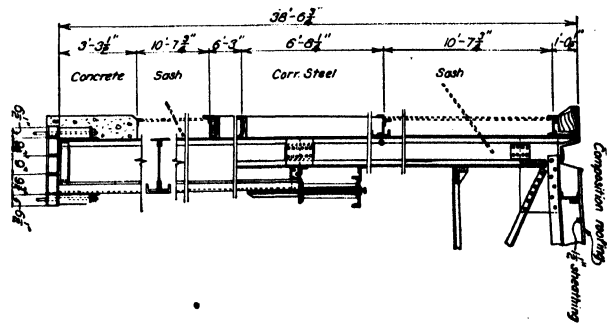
Section through outer wall of machine shop shown in Figs. 91, 92 and 93.
